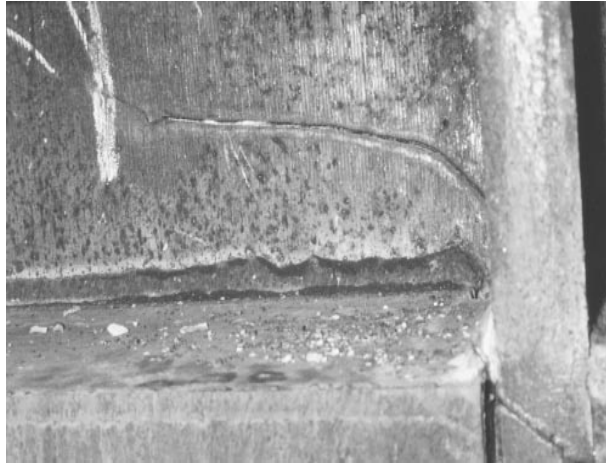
Cracks through column flange and extending into web (Hall, 1995)
